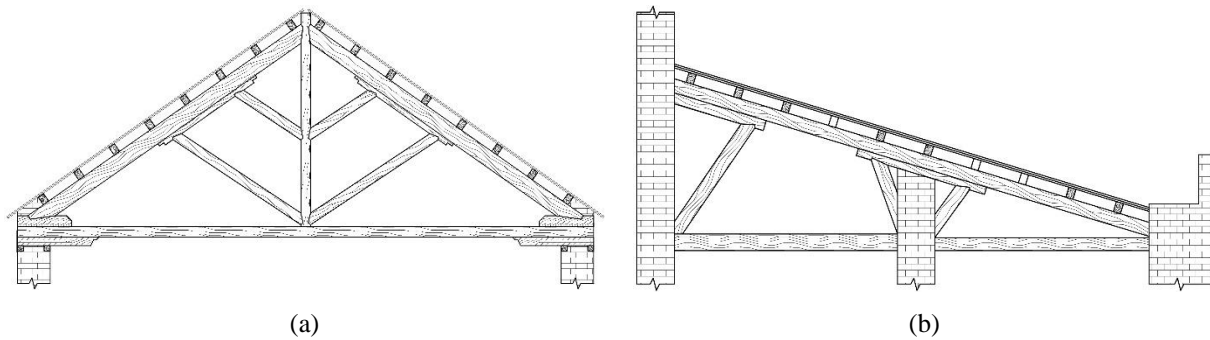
Trusses of nave and transept (a) and aisles and corners (b).
